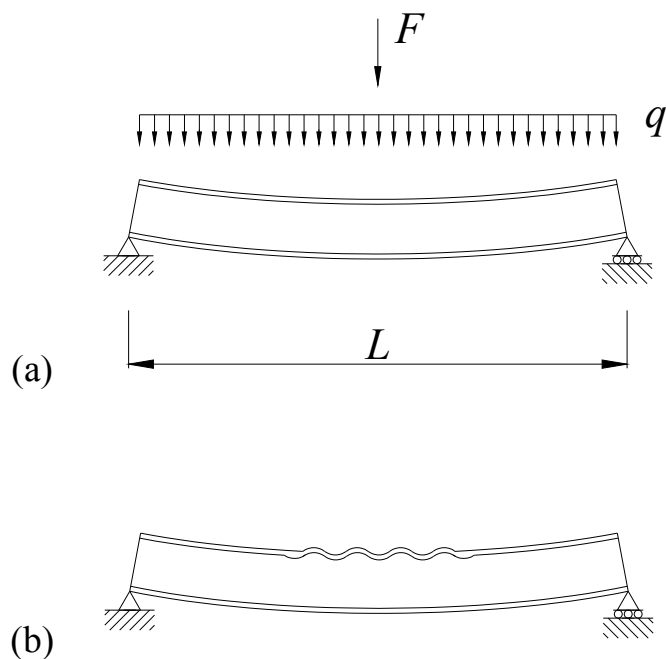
Structural behaviour of a simply supported sandwich panel (a), subject to local buckling of the upper face (b).
